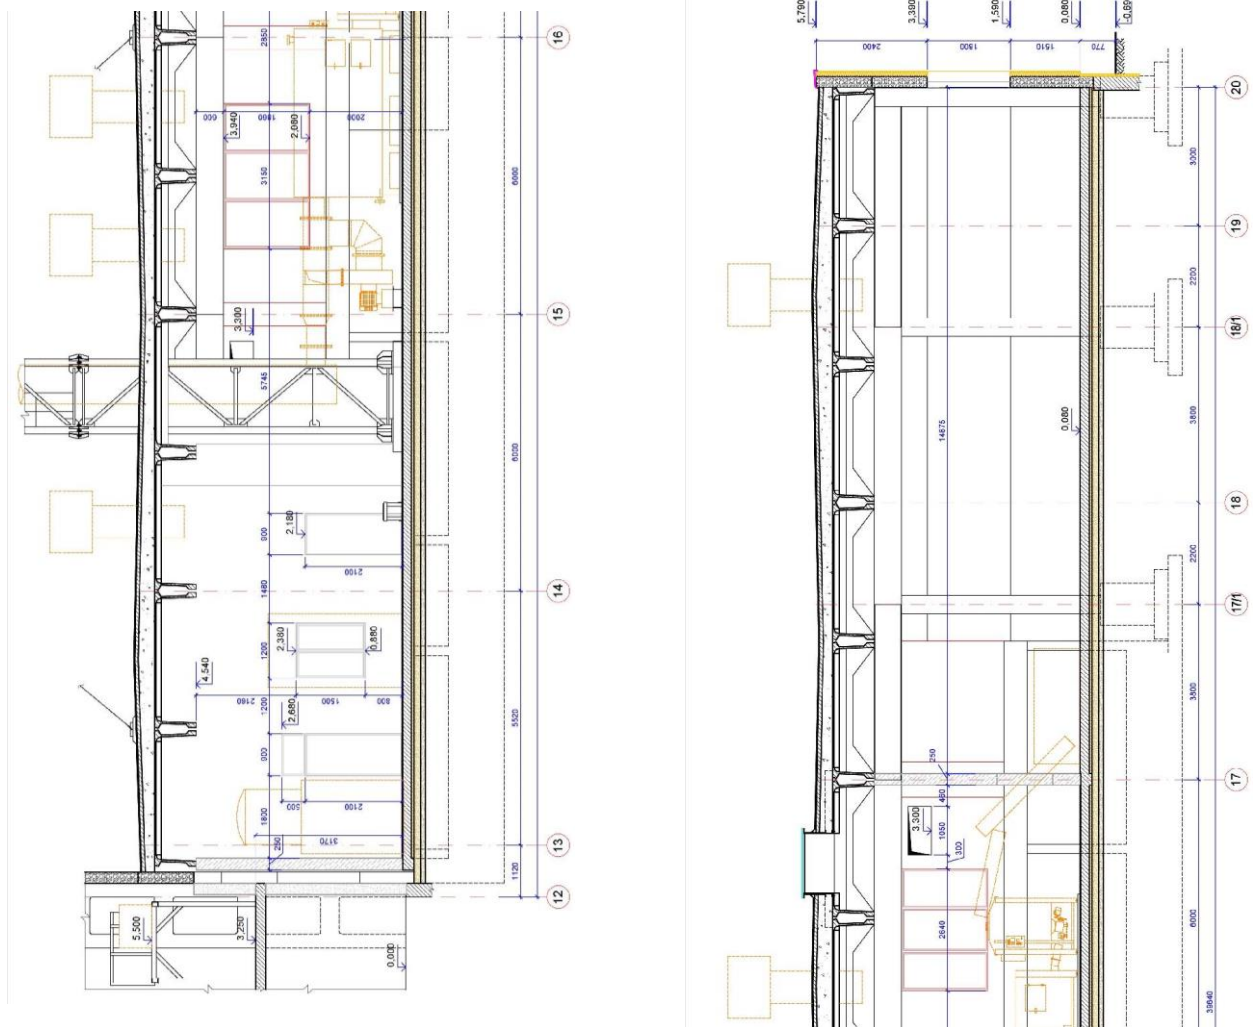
Longitudinal section of the building after reconstruction "2-2"
